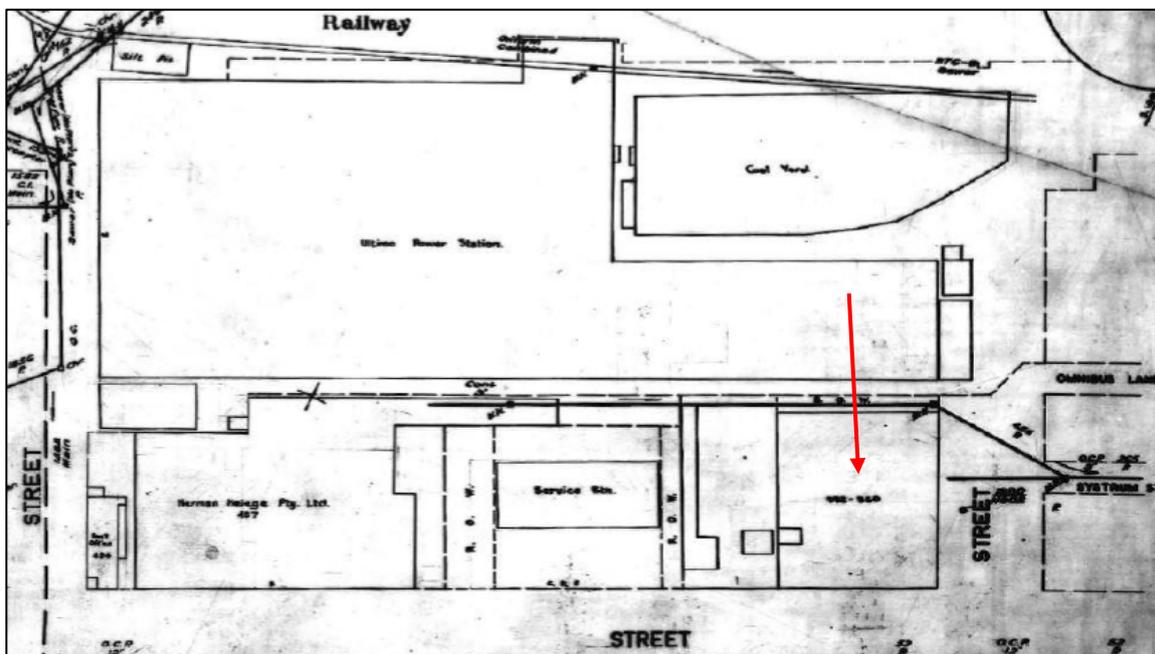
1963 plan indicating building at 552-556 Harris Street, corner of Macarthur Street as indicated by the arrow (Source: Sydney Water archive plan DS3725 (2))
